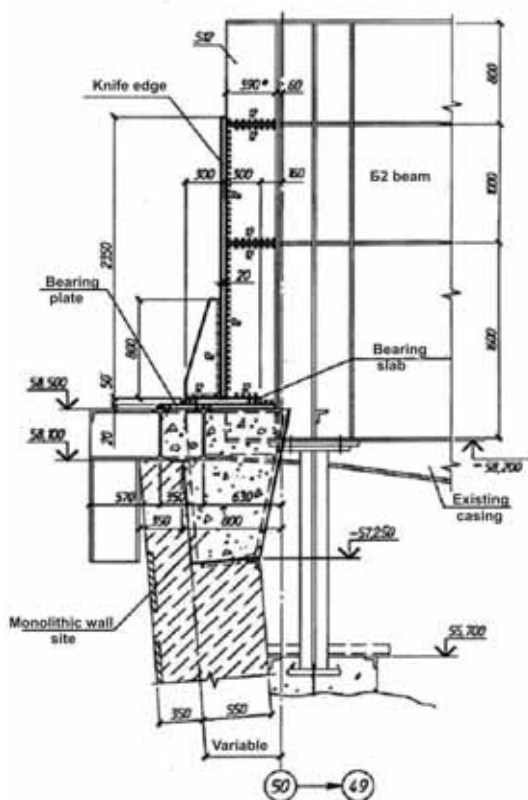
Strengthening of B2 beams supporting parts and ferroconcrete wall along axis 50 in place of resting upon it of B2 beams unit (row Ж)
